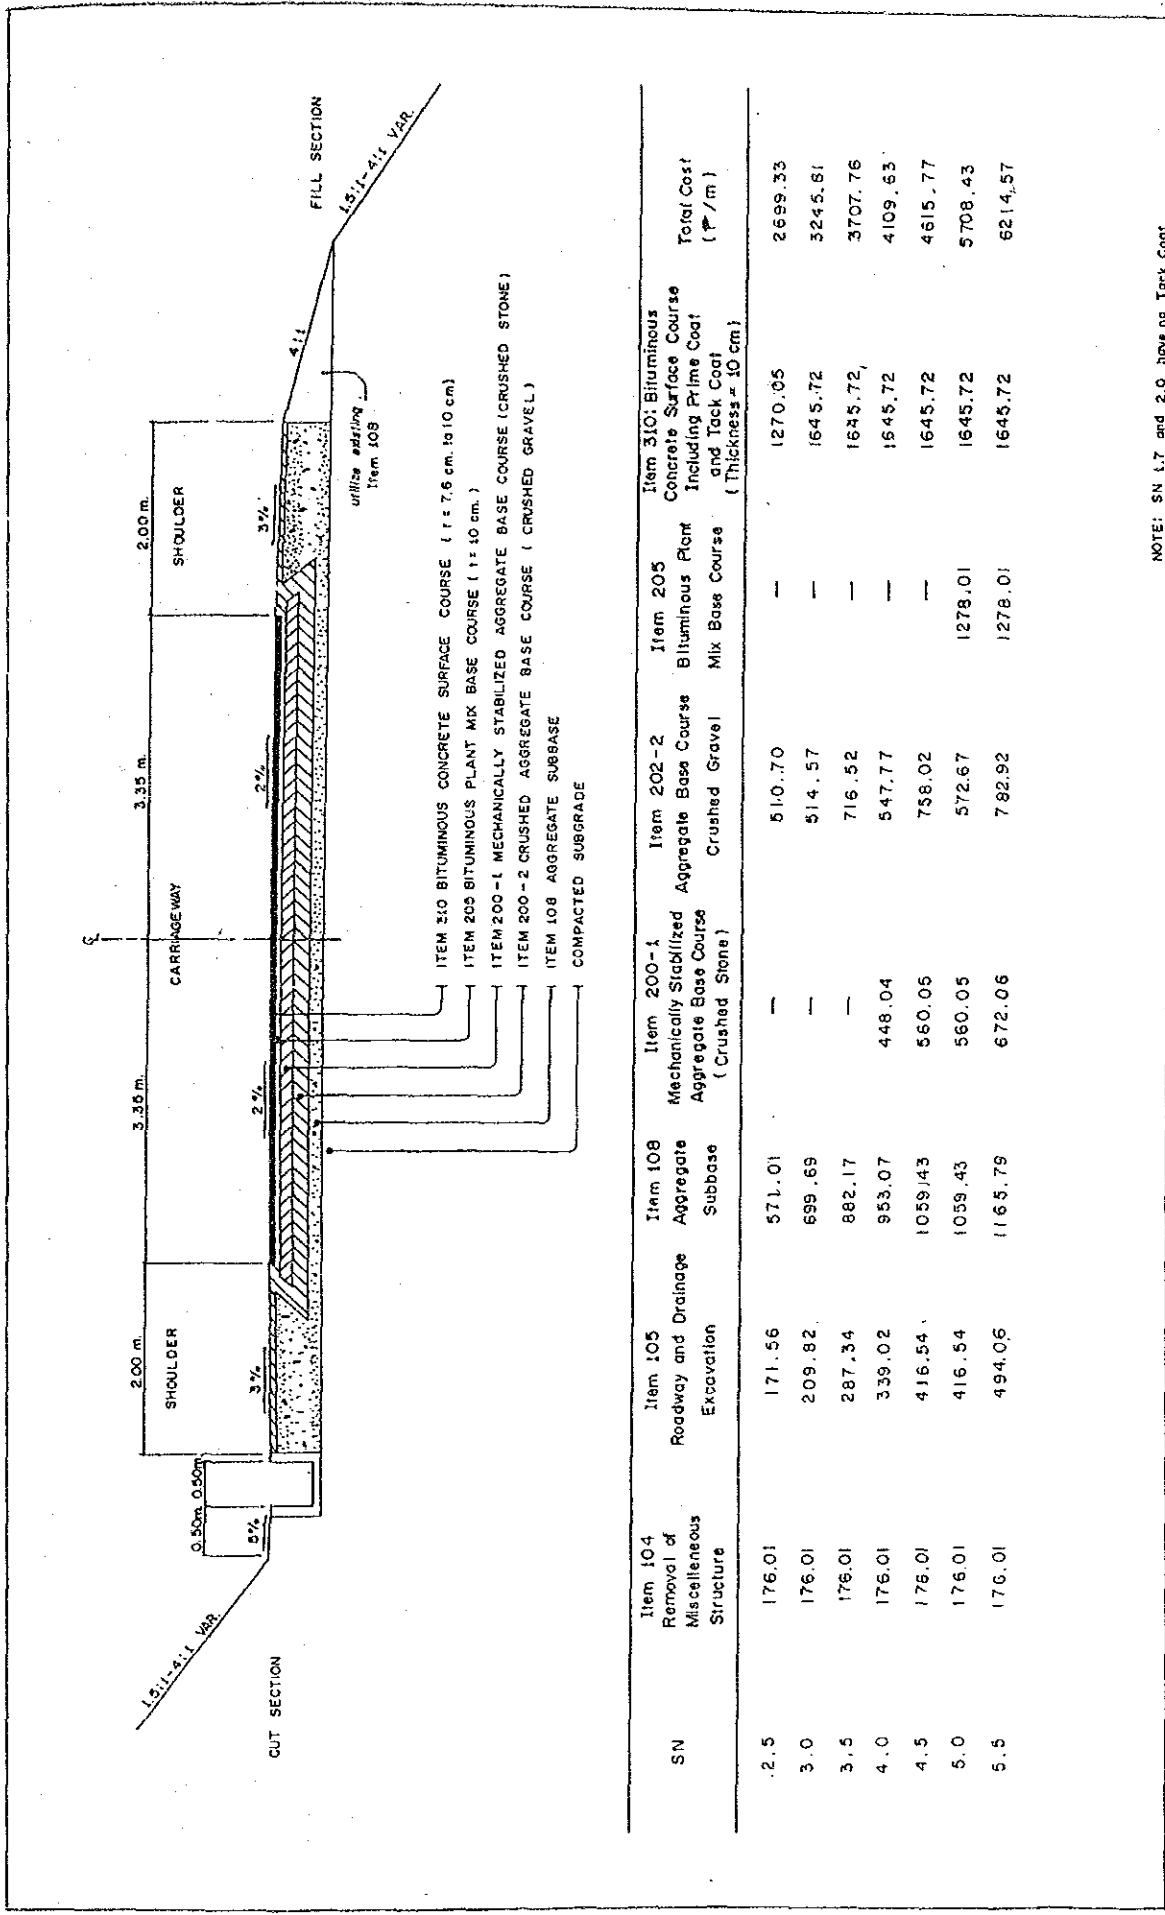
TYPICAL CROSS - SECTION
